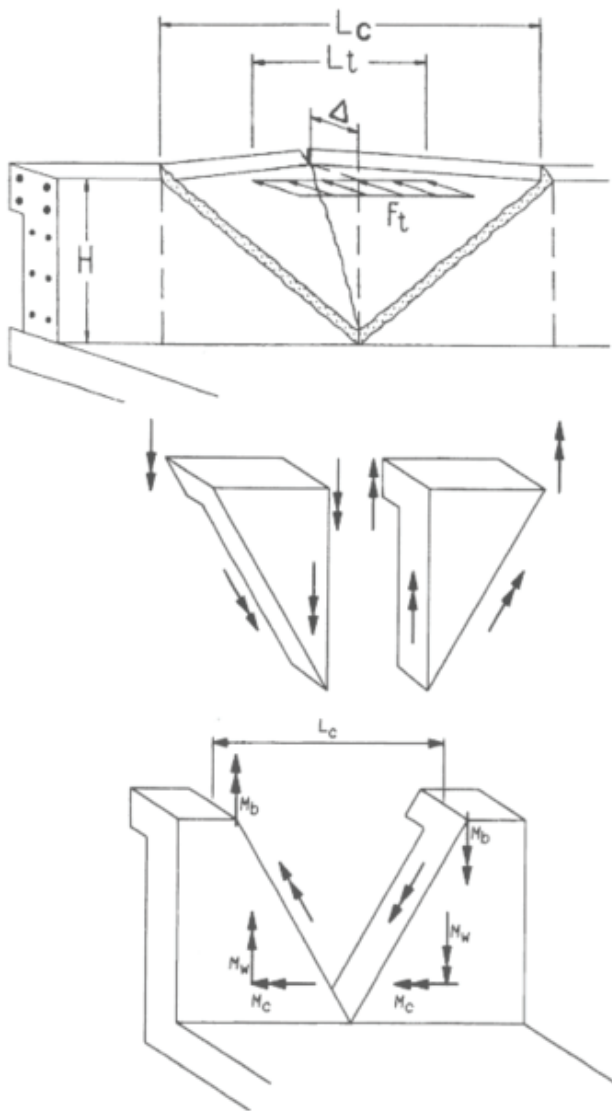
Yield Line Analysis of Concrete Parapet Walls for Impact within Wall Segment
